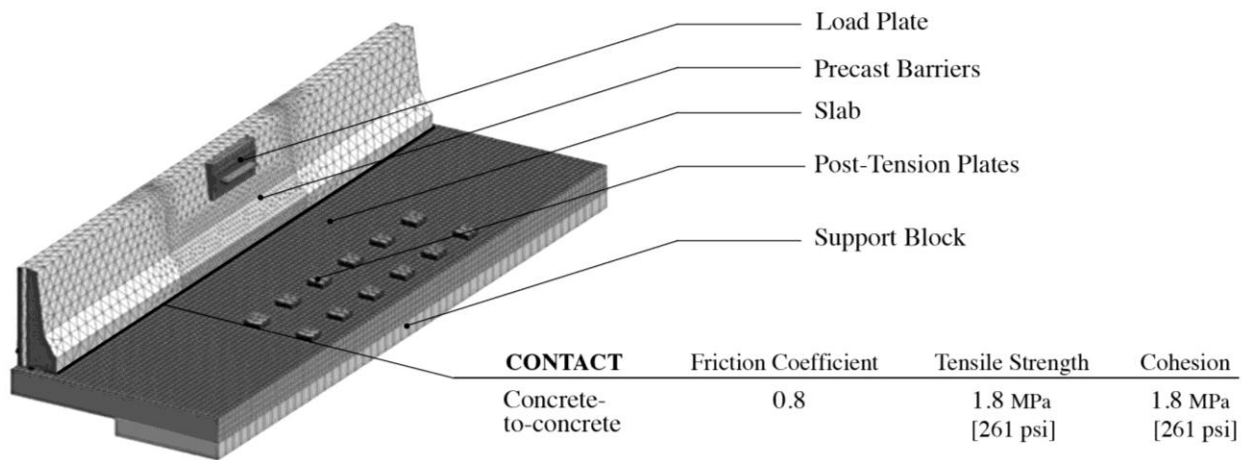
Numerical Model, Test Configuration 3 Precast Barriers with Connections
